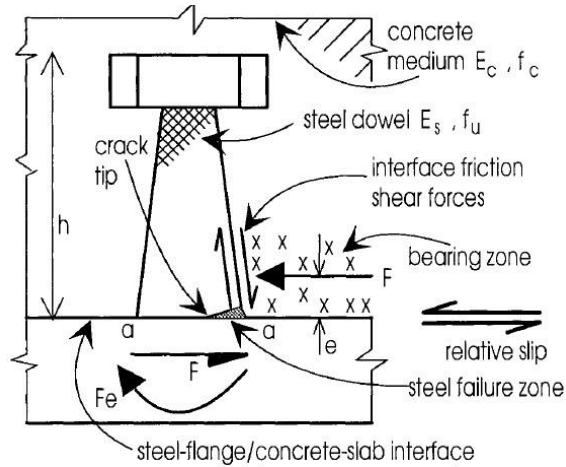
Dowel action of welded headed studs [2.3]
